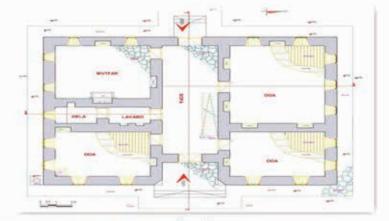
Ali Paşa House Ground Floor Layout (Ş. ÖZTÜRK)
